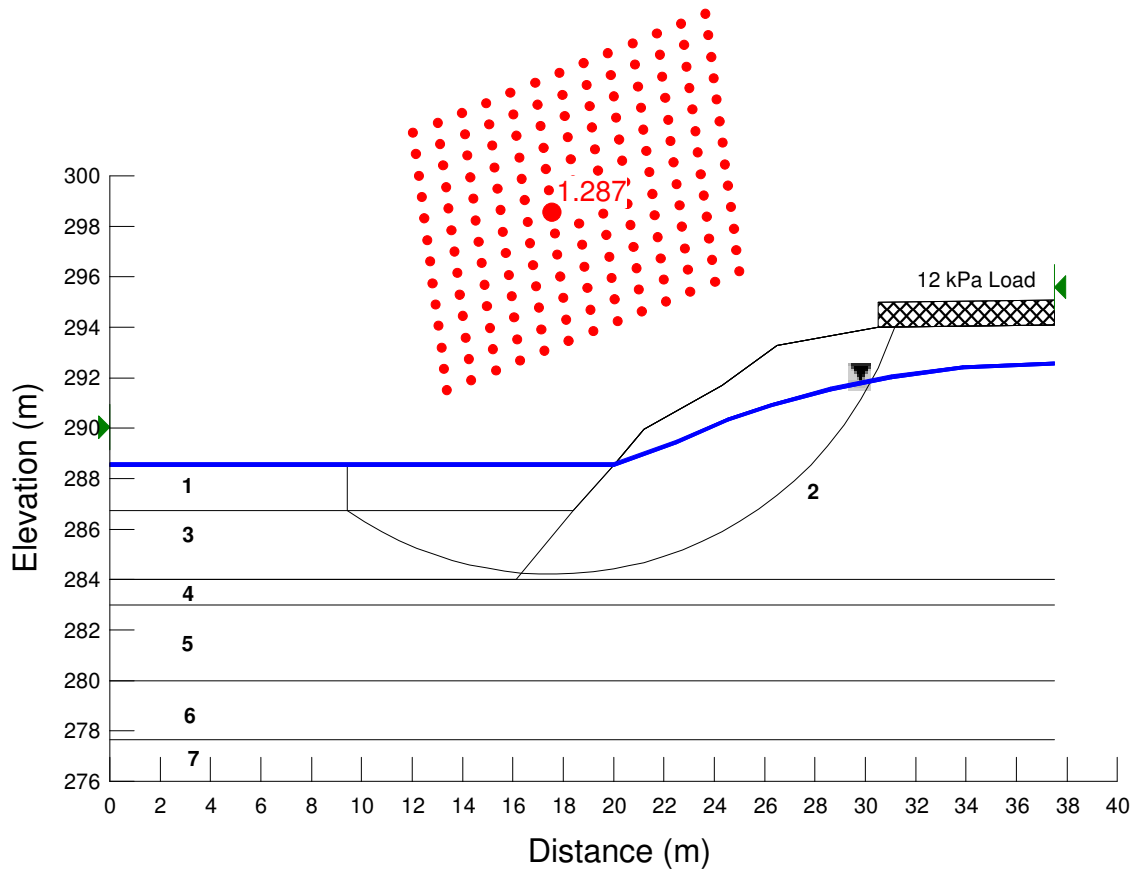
Stability of HWY11 Road Section at Sta. 14+800
